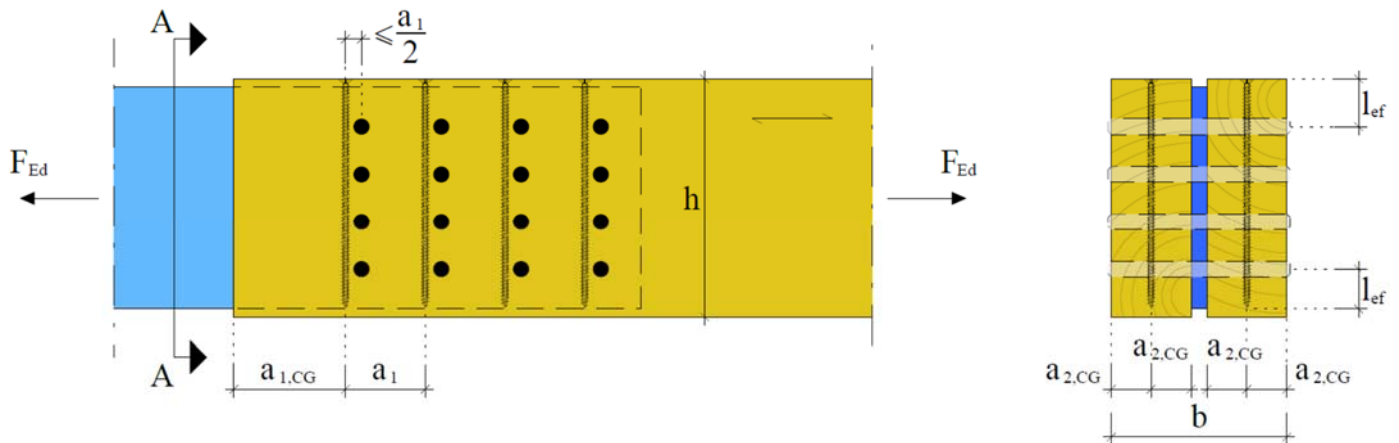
Dowelled steel-to-timber connection with outer timber members and reinforcement;
